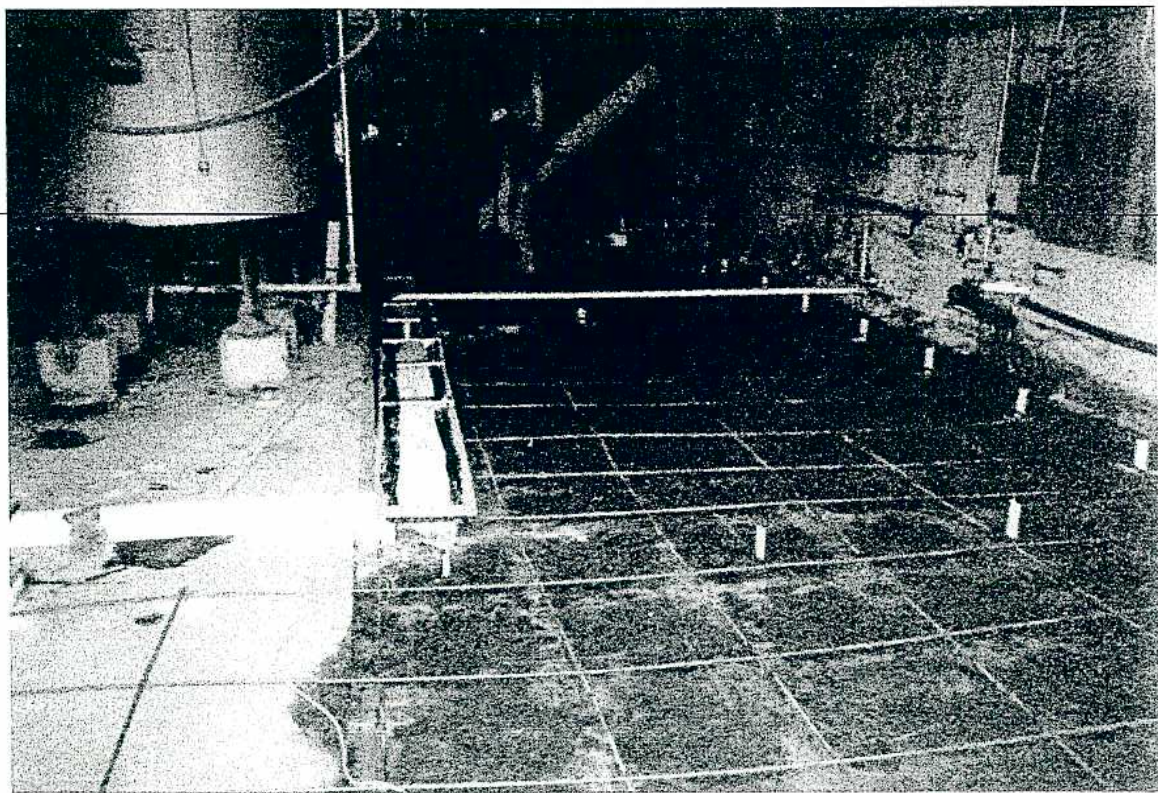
View to East of partially cemented pit, floor trench, and reinforcing rod for new floor.
